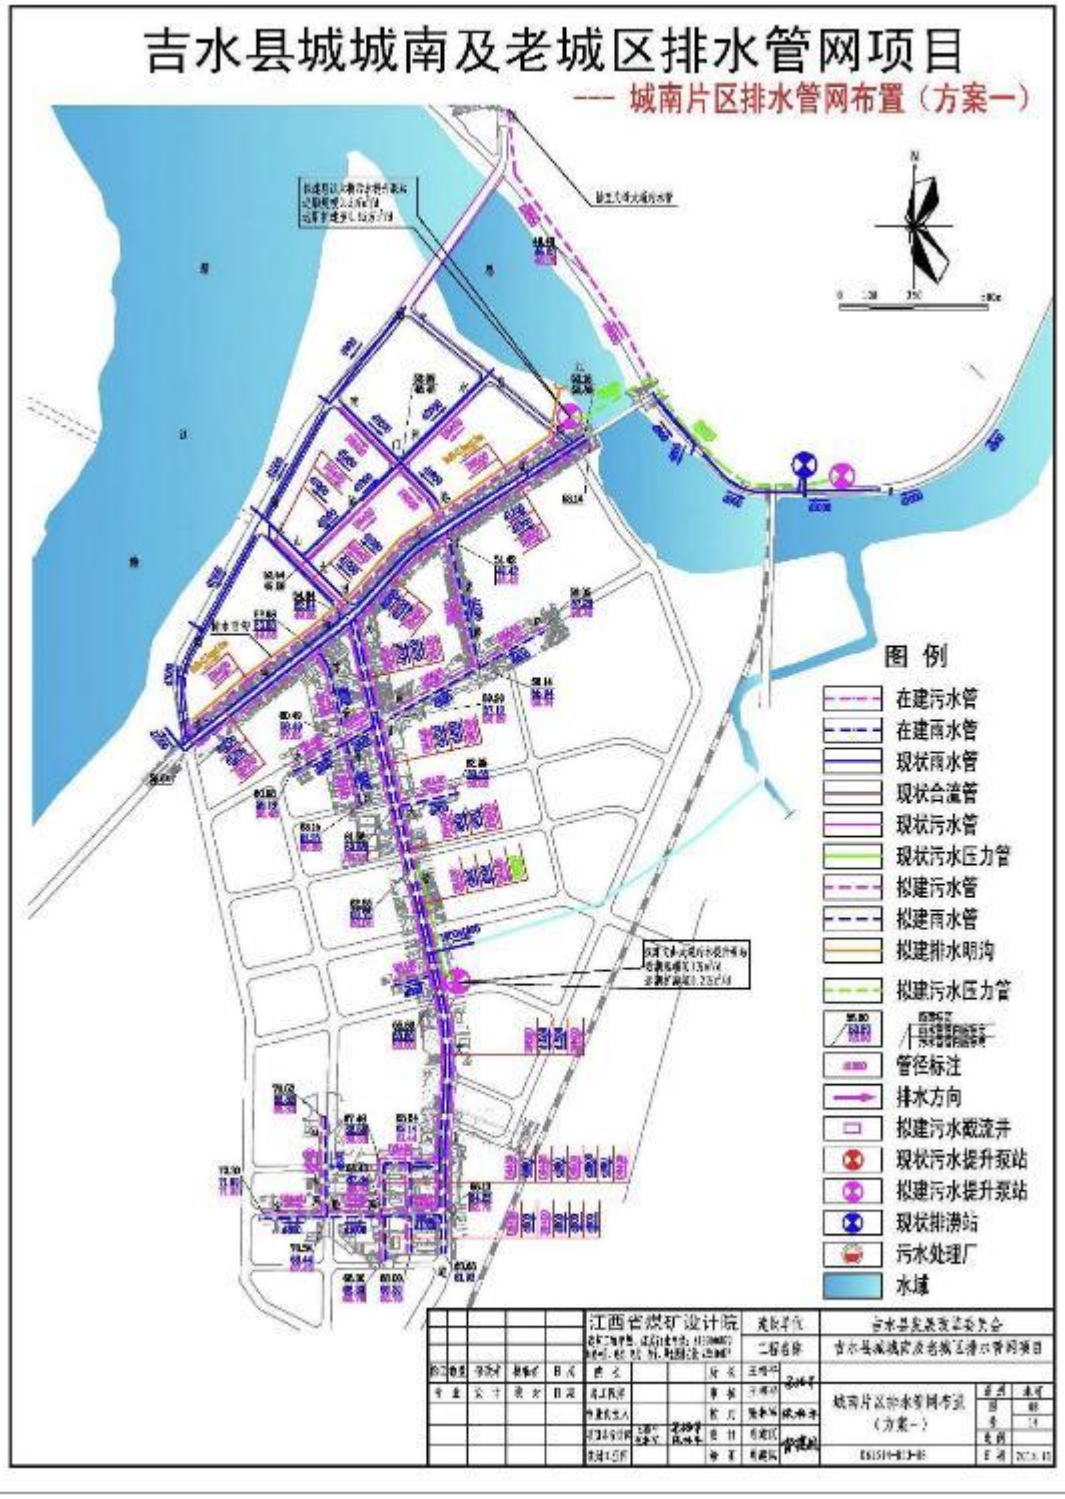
Jishui County Sub Project -- Old Town area Drainage Pipeline layout
